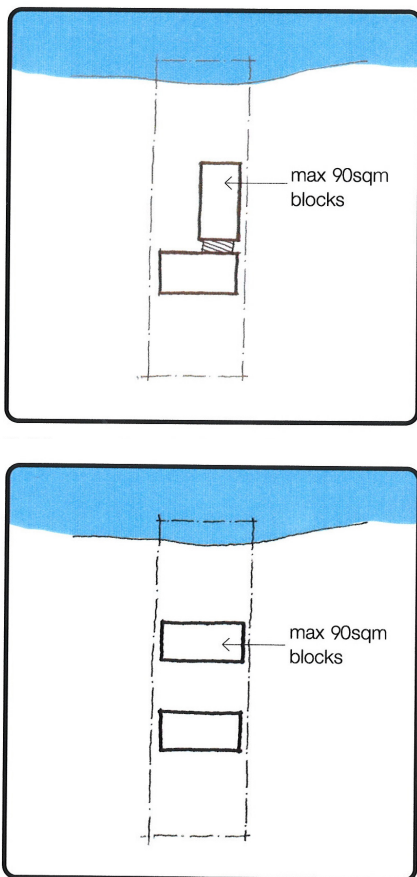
(a): Buildings in the C4 zone are to be broken up into smaller ‘elements’ to ensure a more appropriate scale to the built structures along the waterway.(l)
